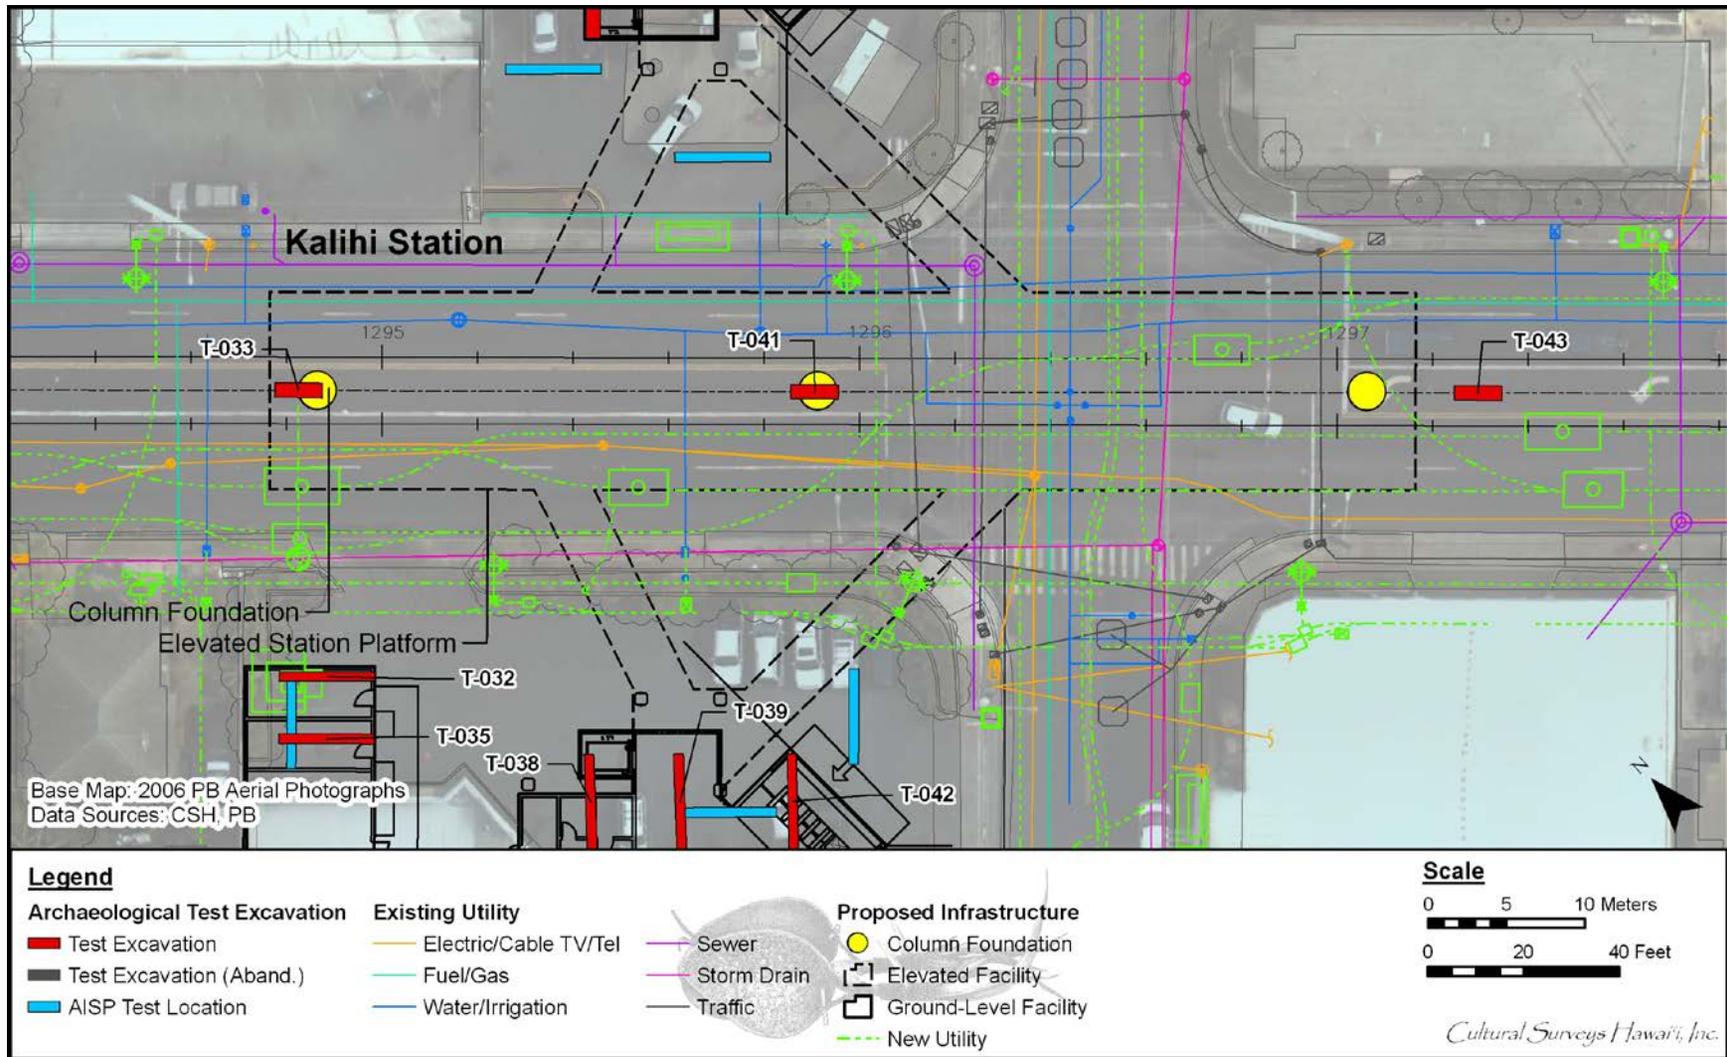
Kalihi Station, detail of column foundation layout at Dillingham Boulevard showing locations of proposed AISP and actual AIS test excavations
